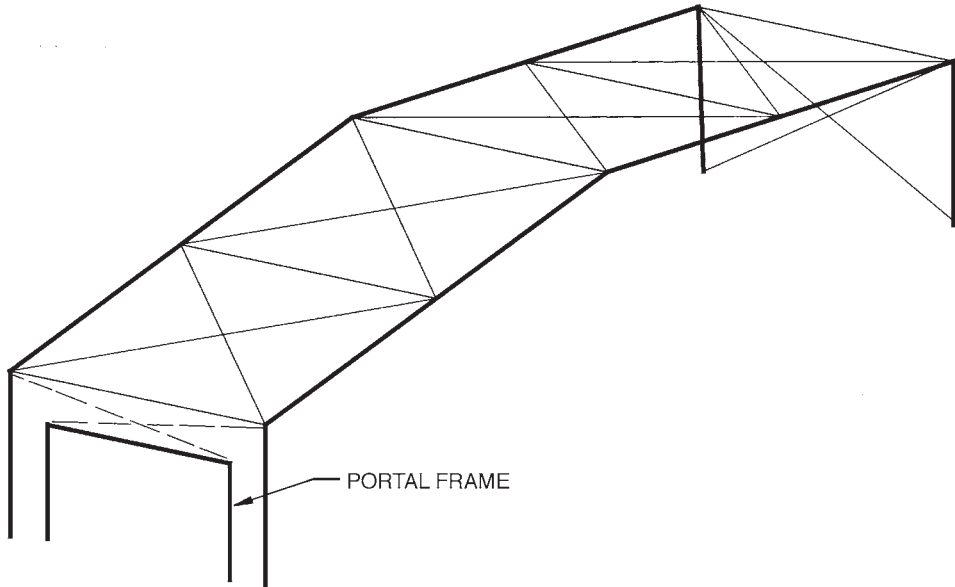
Sidewall portal frame. One manufacturer recommends that it be used only if *all* of the following conditions are met: The eave height ≤ 30 ft; the width ≤ 240 ft. (*Nucor Building Systems.*)
